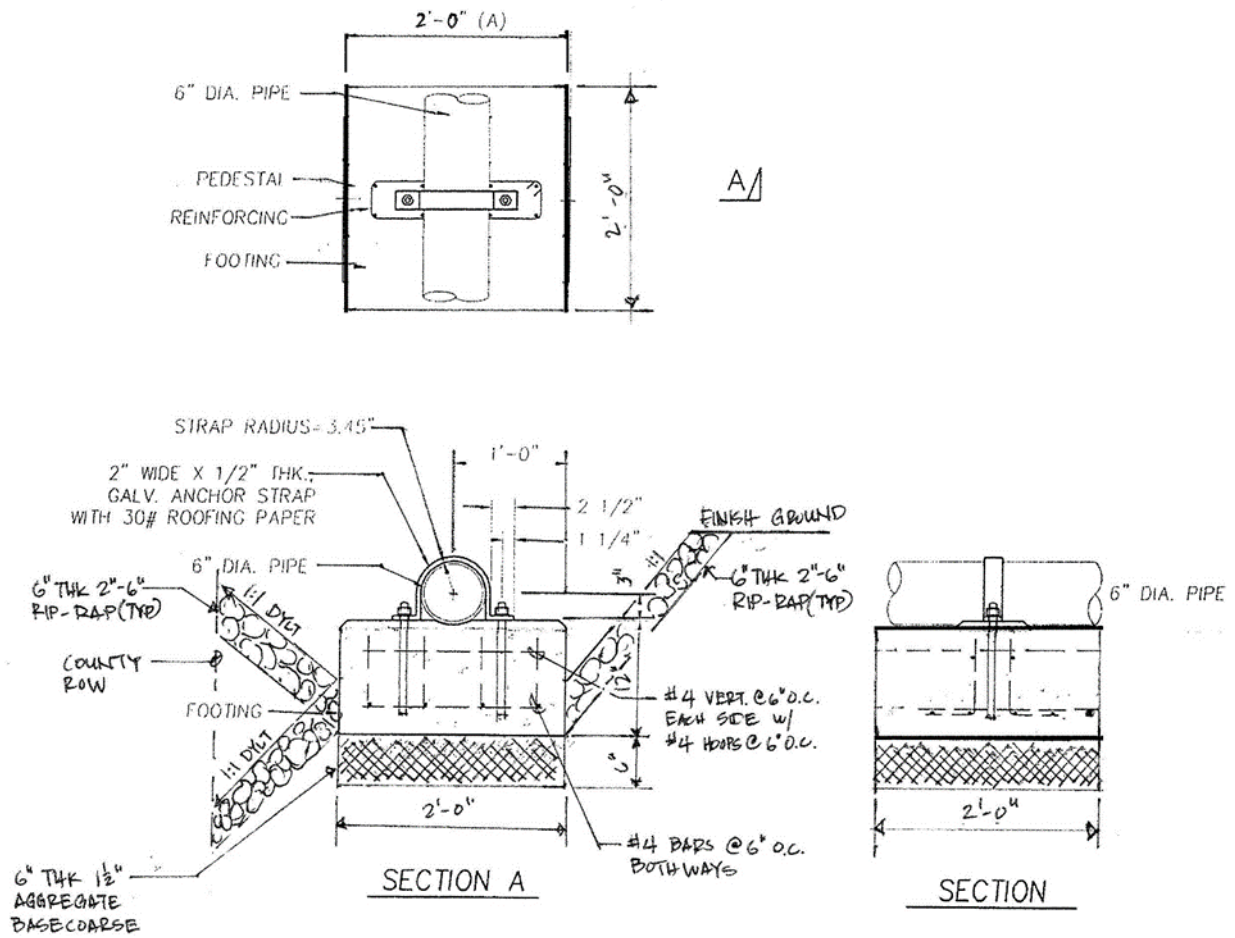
Typical Section for Water Line Installation in V-Shaped Riprap Trench
